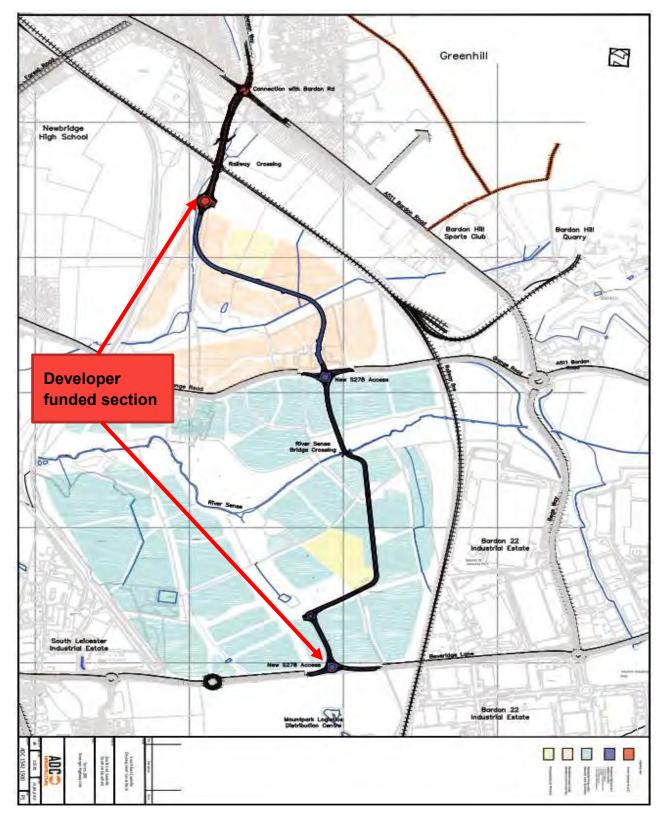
Bardon Link Road alignment showing developer funded section
